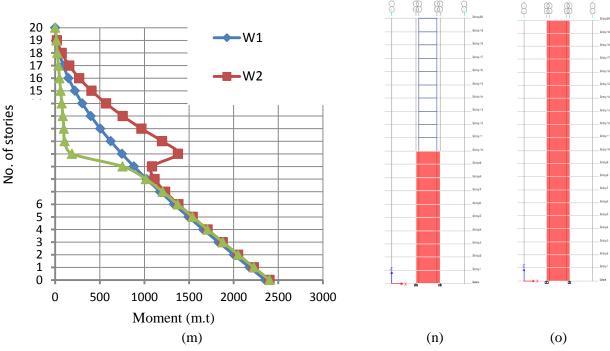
(m) Represents the comparison of bending moment results between W1, W2 and W3- (n) Elevation of W3 shear wall modified to frame system at 10<sup>th</sup> floor- (o) Elevation of shear wall W1 for model 1 and W2 for model (1-e).
